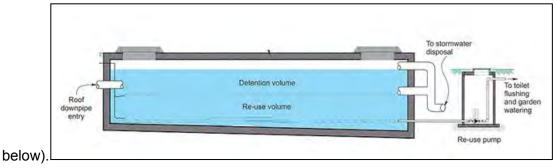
Typical combined on-site detention & rainwater re-use storage tank
